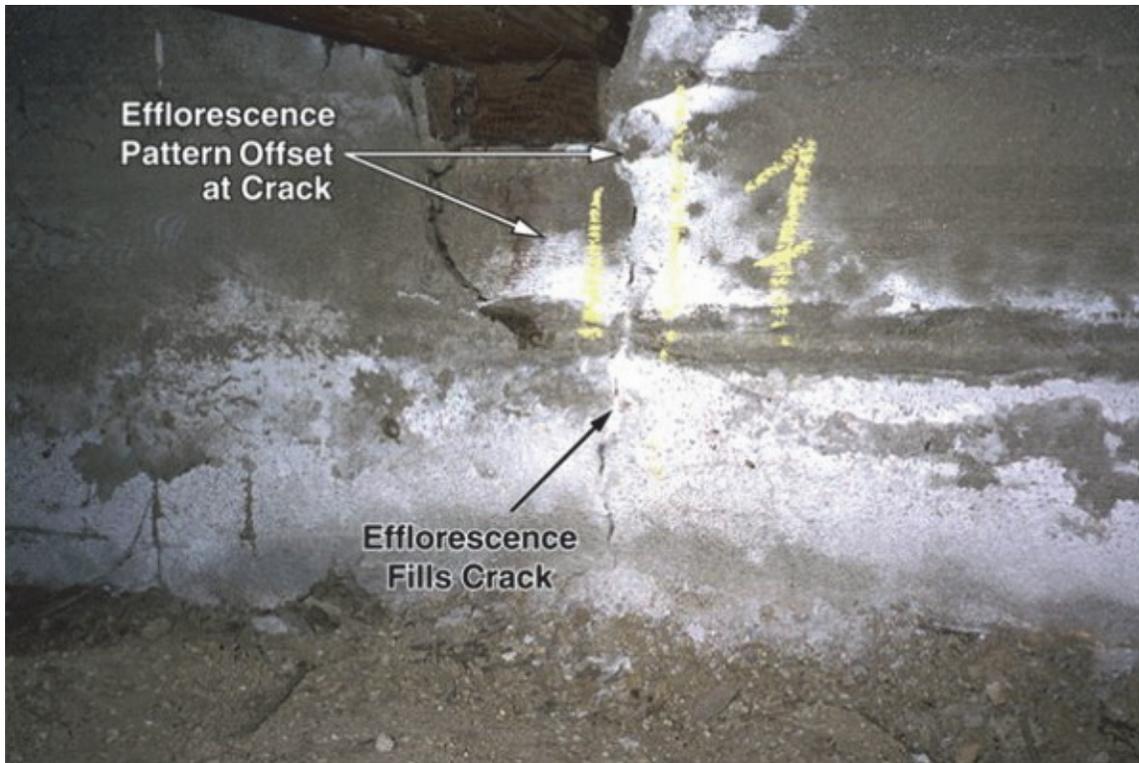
Pattern of efflorescence around crack in stemwall indicates that crack is not of recent origin (photo credit: Exponent).
